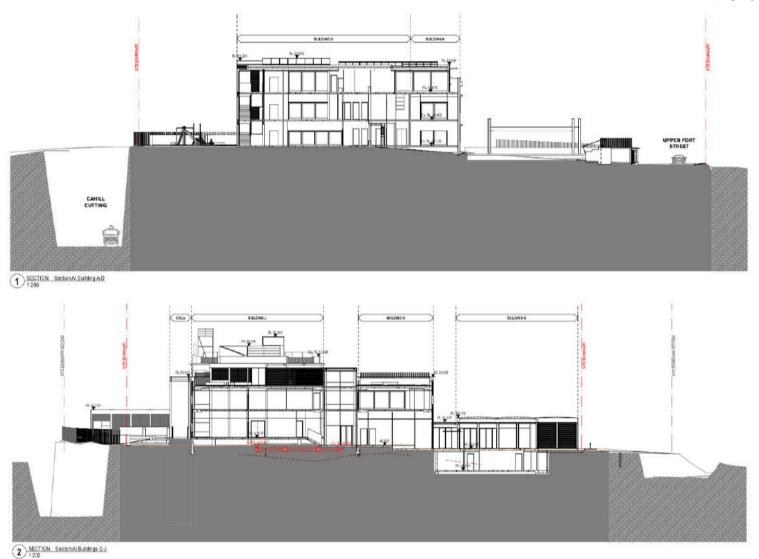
Proposed Buildings A-D and Buildings G-J Sections (Source: FJMT Studio, DWG DA-4003, 18.12.2019)
